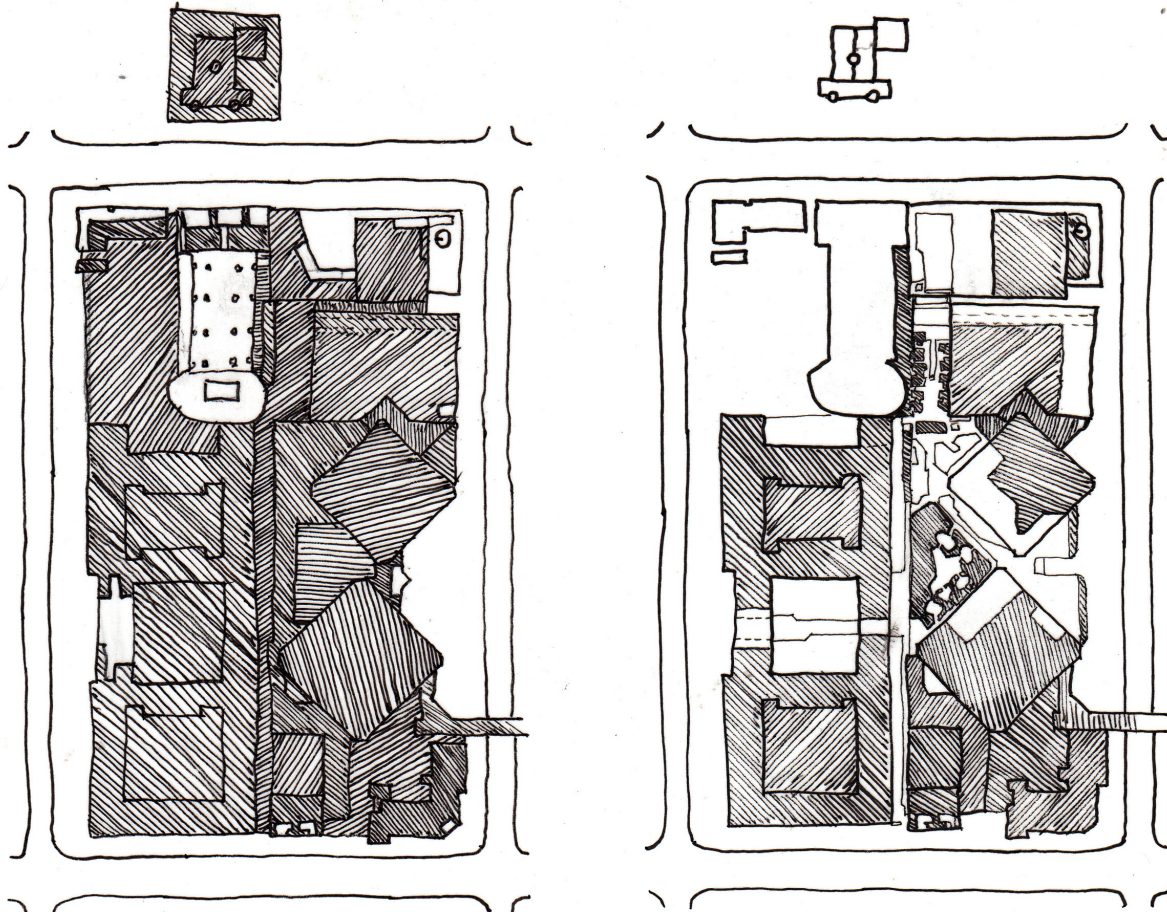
Site plans indicating access to site before (left) and after (right) intervention (Author 2013).
